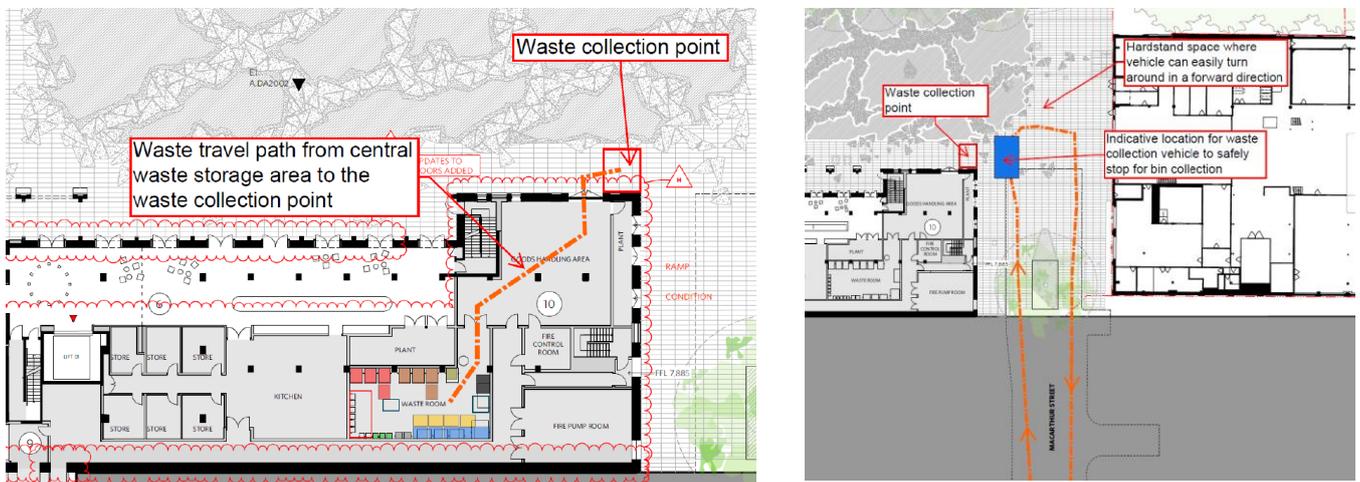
Ground floor waste path of travel and MRV travel path to waste collection point
